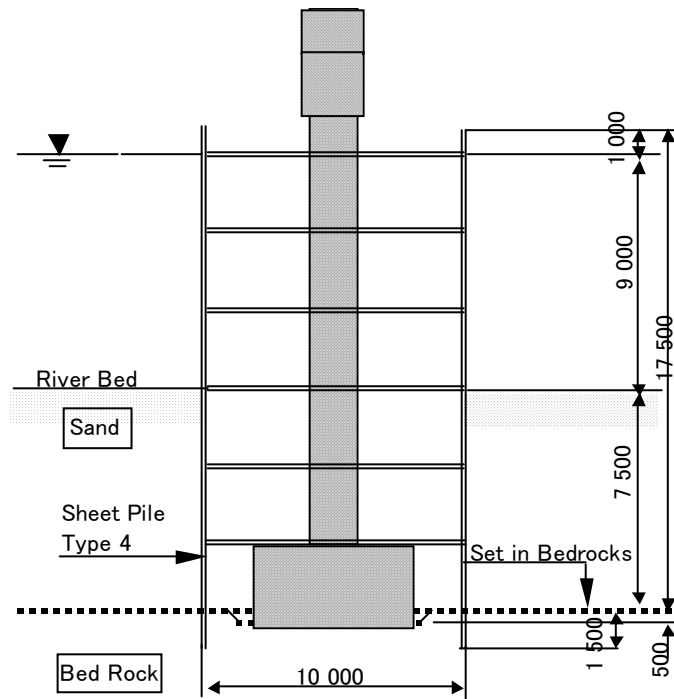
Typical Arrangement of Steel Sheet Pile Cofferdam
